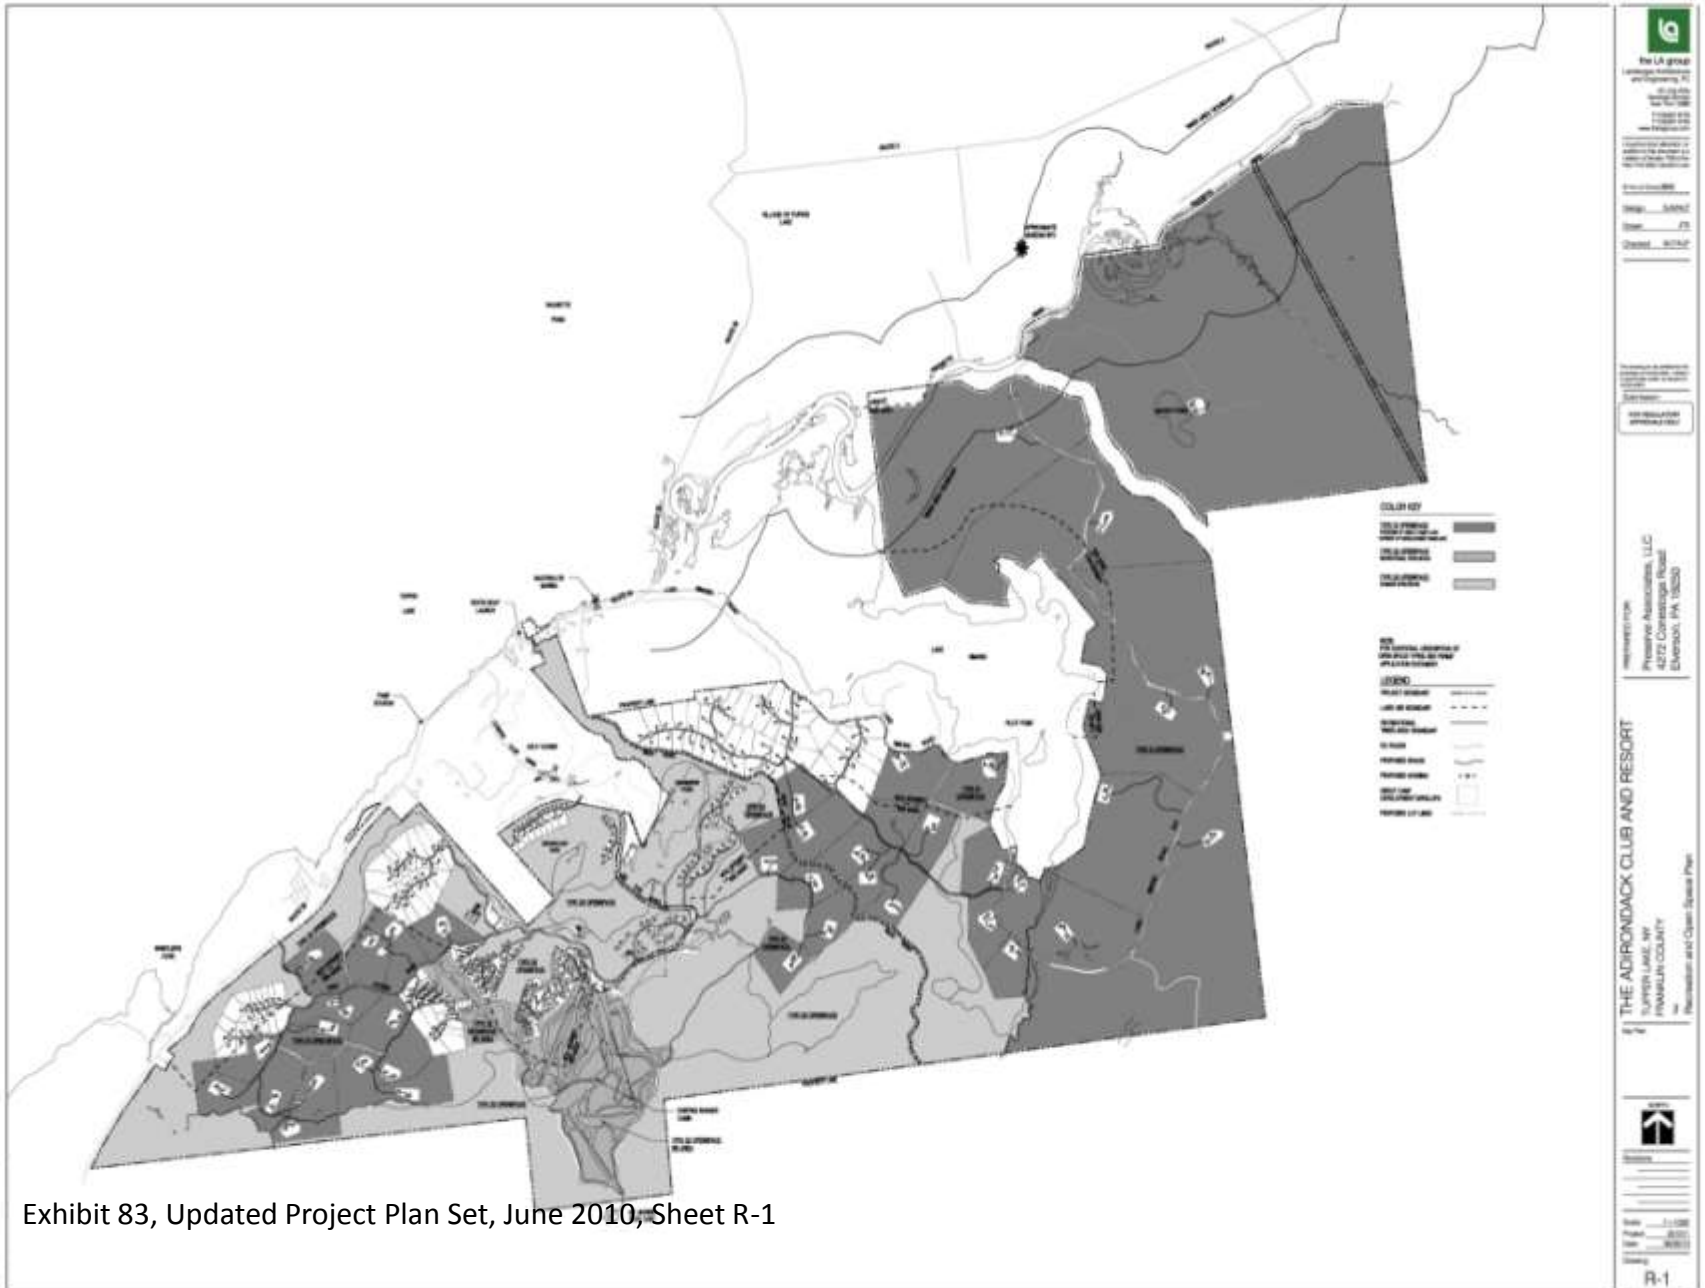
, Updated Project Plan Set, June 2010, Sheet R-1
